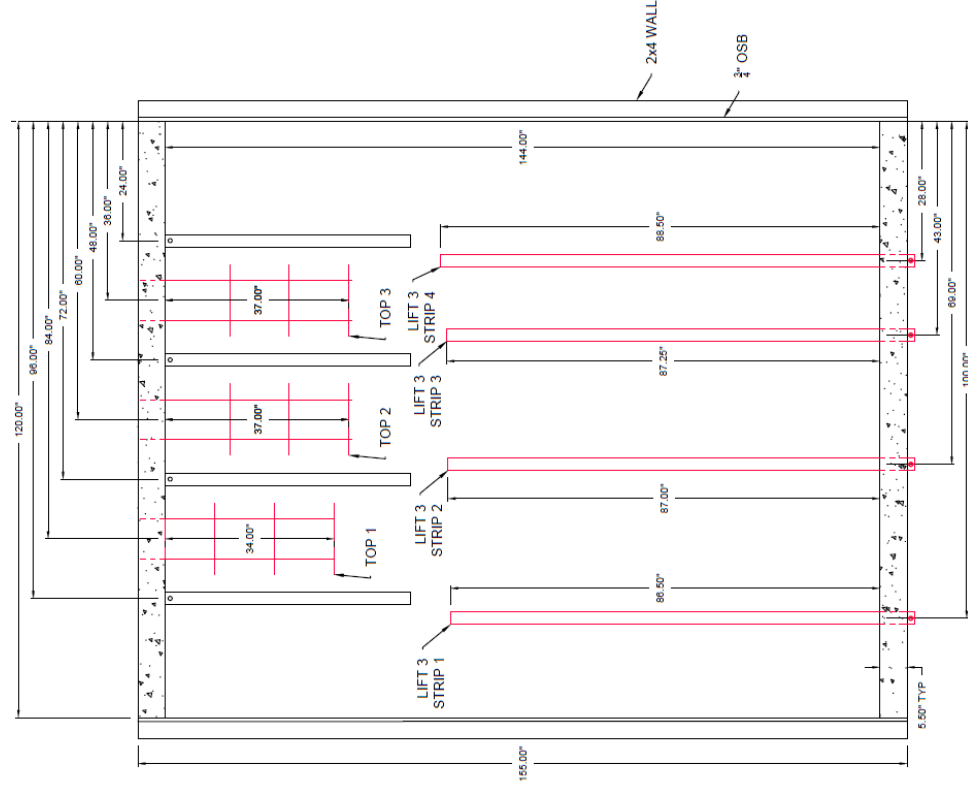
Continued Plan view showing the arrangement of pull-out reinforcements (shown in red) in: (a) lift 1, (b) lift 2, (c) lift 3, (d) lift 4 of LCC for Test 6
